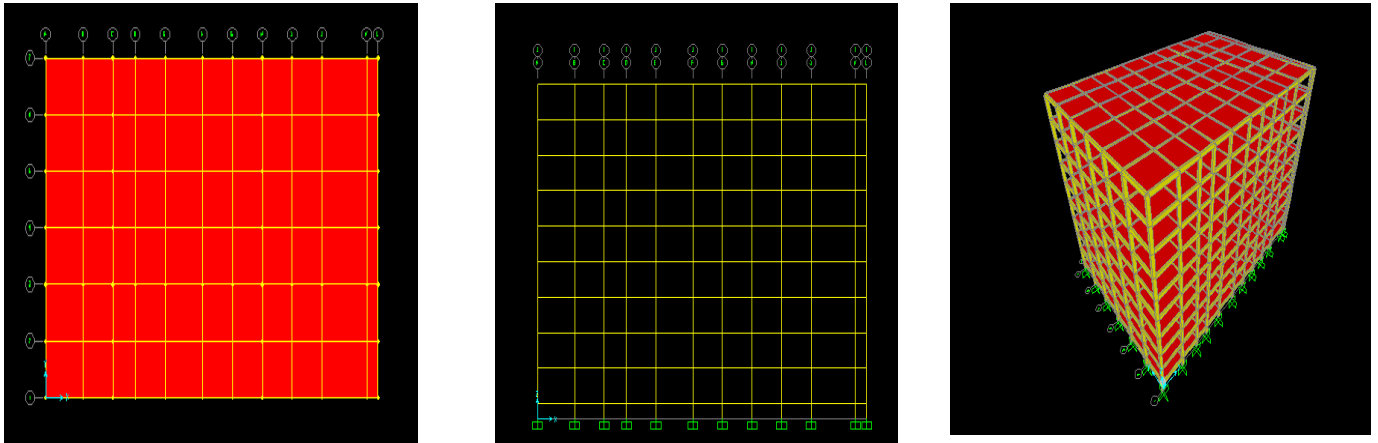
Plan, Elevation and 3 D View (MODEL 3)
